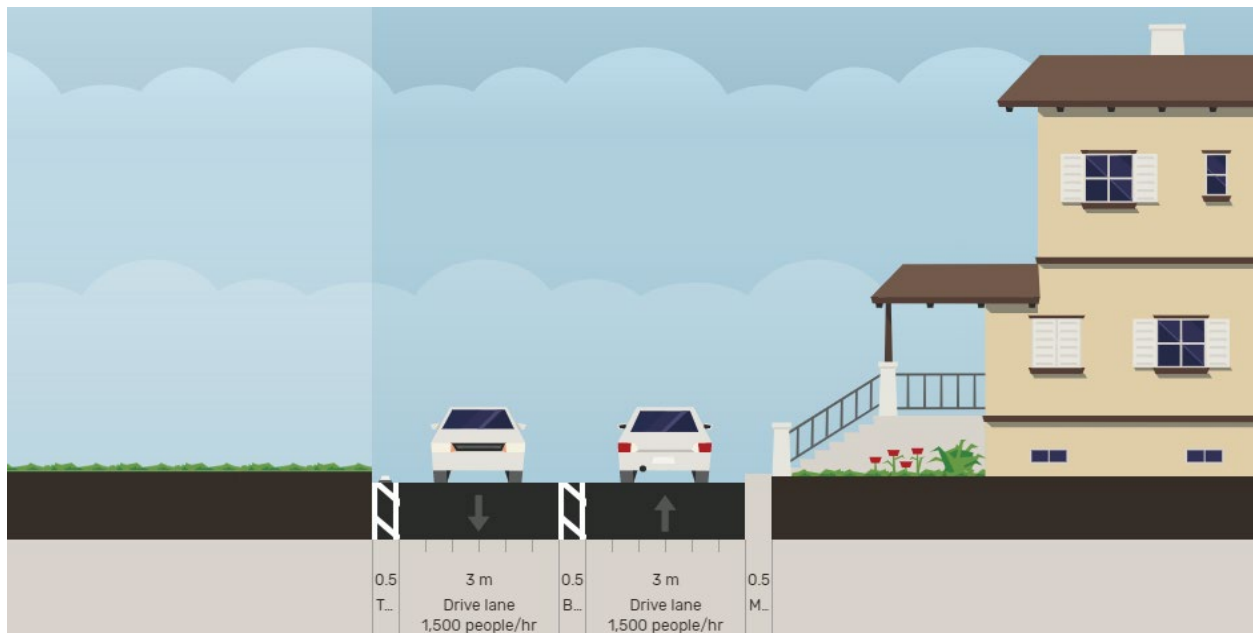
Lake Drive East: Ravenswood Drive – Lorne Street
